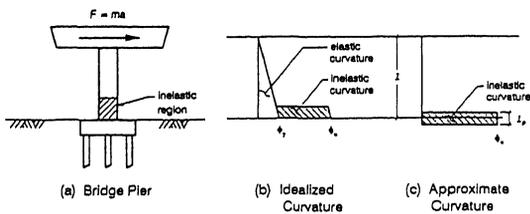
Simplified Curvature Distribution in Cantilever Bridge Pier
